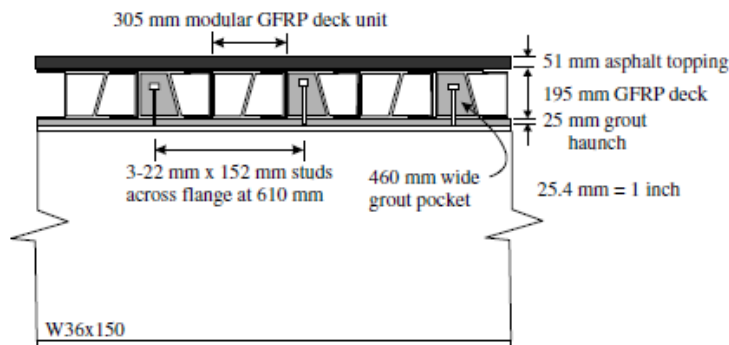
A typical deck cross-section showing shear stud connection, haunch and grout pockets (Turner et al., 2004)
